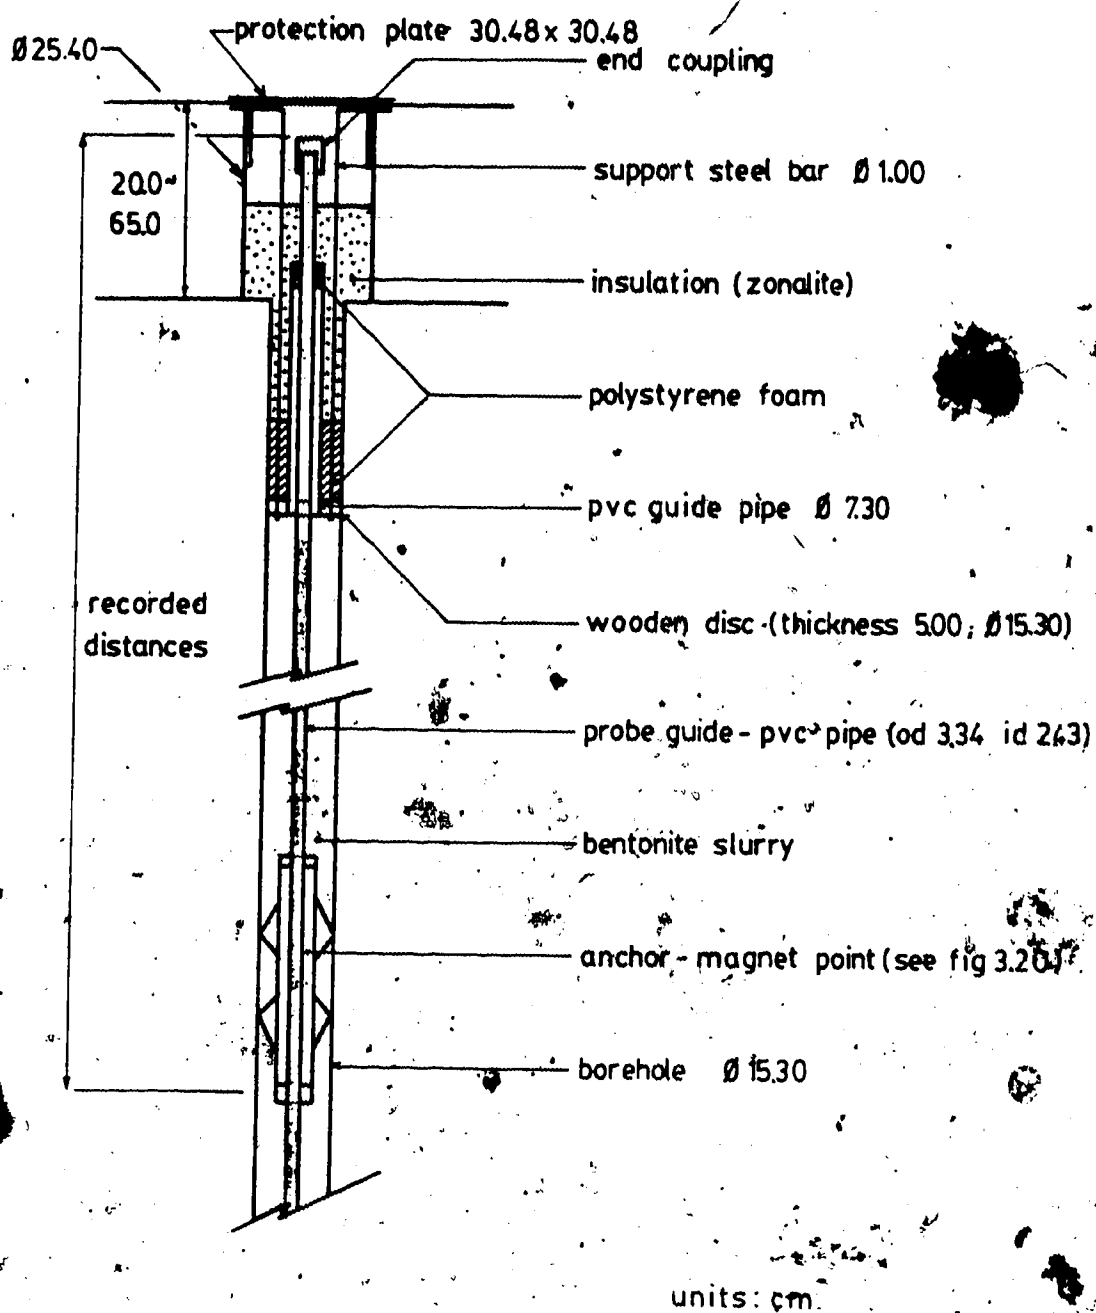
MAGNETIC MULTIPOINT EXTENSOMETER - DESIGN
